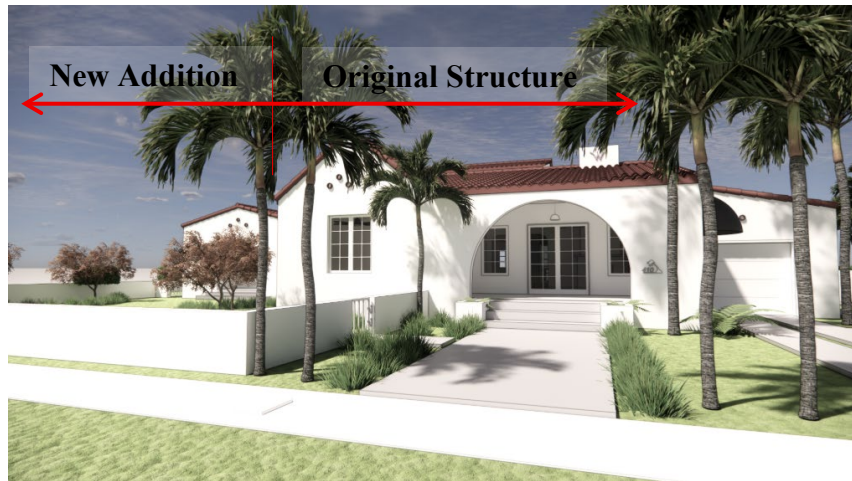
Proposed Front Elevation of Minorca Avenue | Vertical Design Studio
